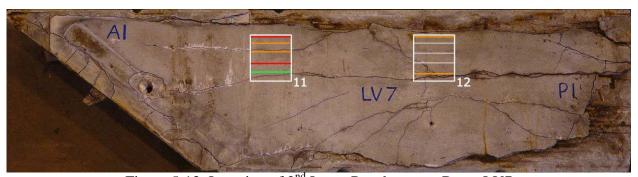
Location of 2<sup>nd</sup> Layer Punchouts on Beam LV7
